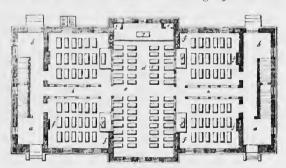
Plan of the First Floor, adapted to Figs. 157 and 159. (See also Fig. 134
